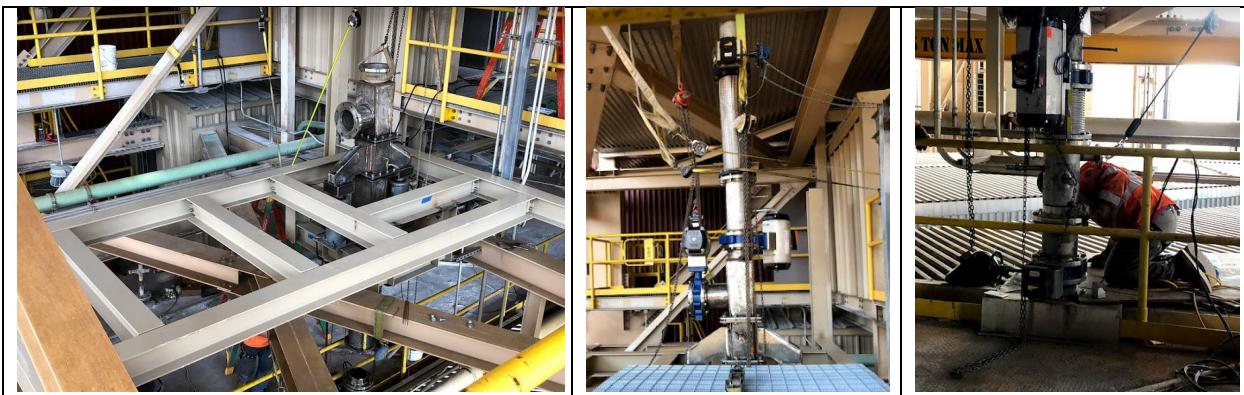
Steel Braces, APH Unit Set, Flue Gas Inlet and Outlet Lines Installed.
